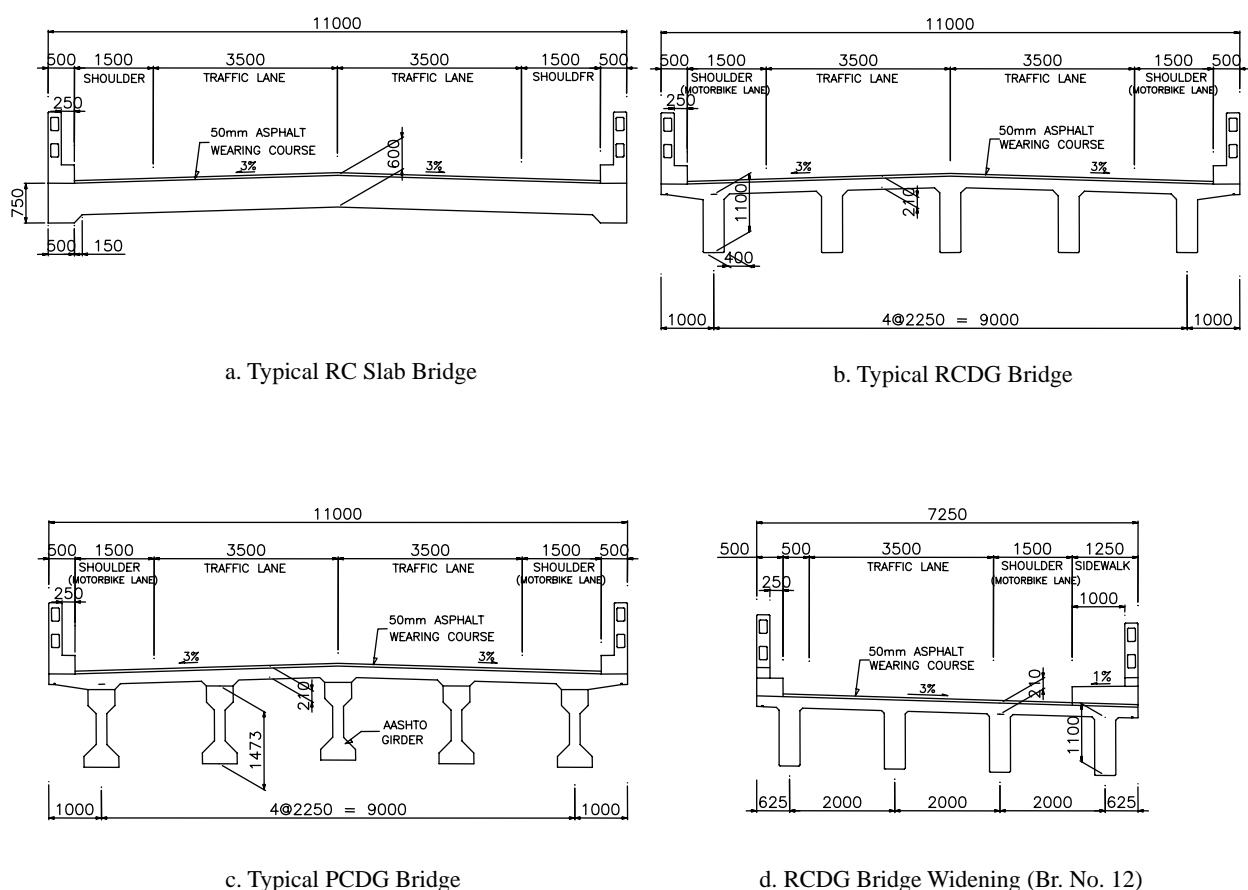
Basic Bridge Cross-Sections for NR.57
